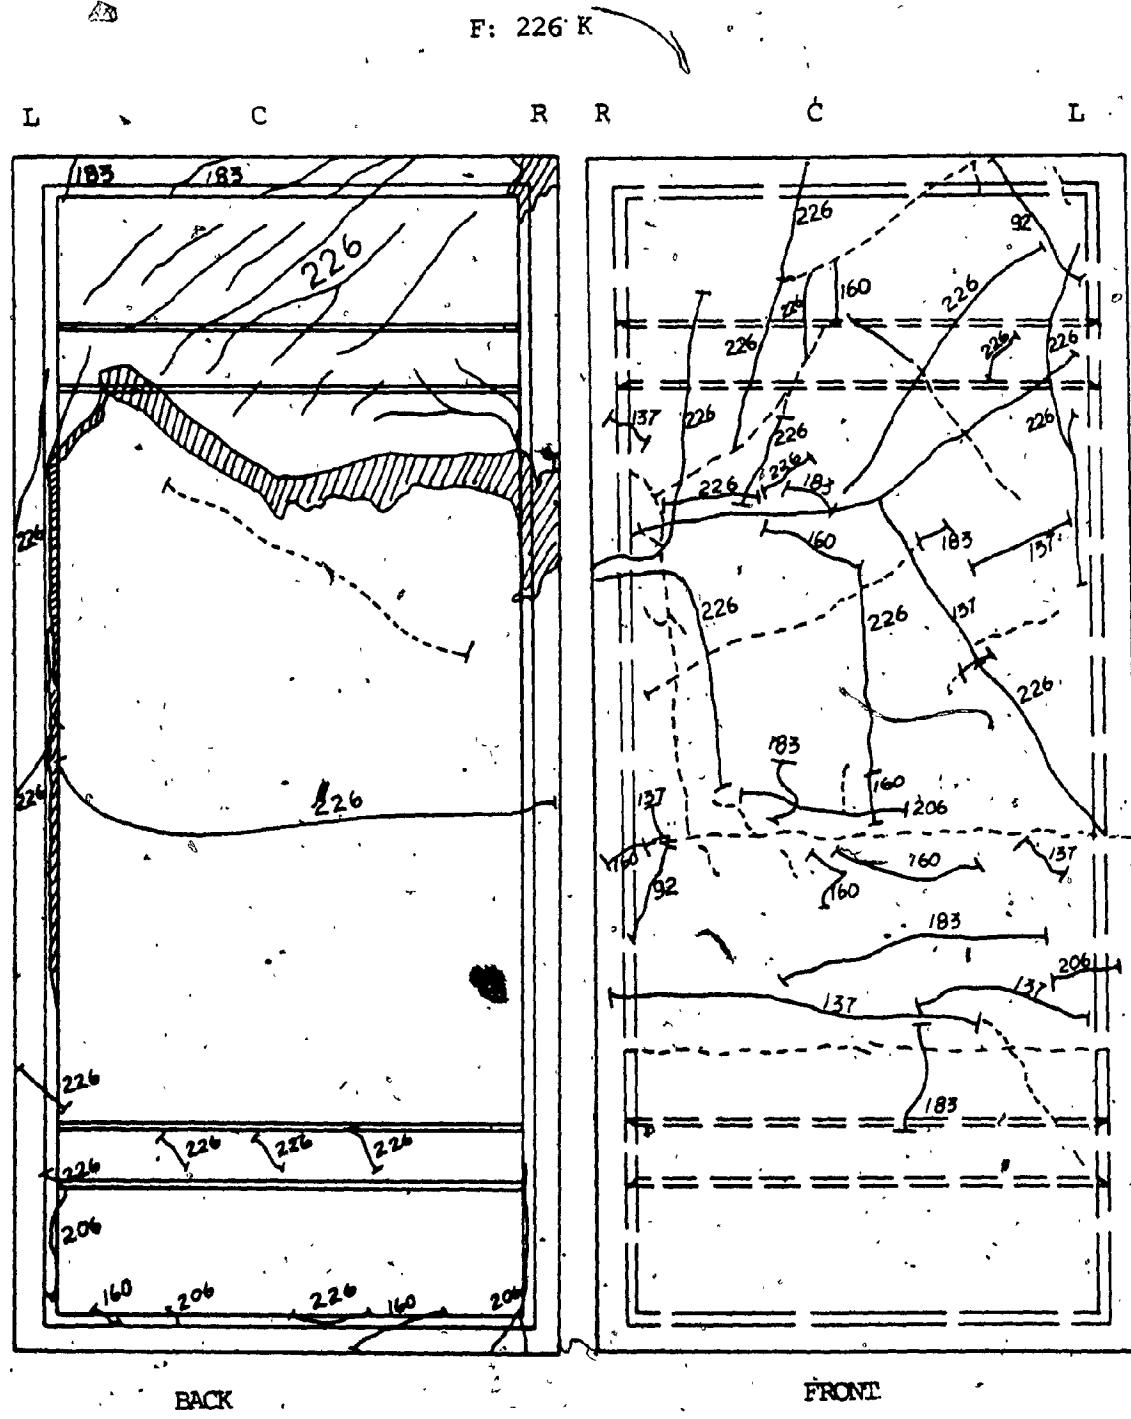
Crack Pattern Panel 168-11 (H2)
